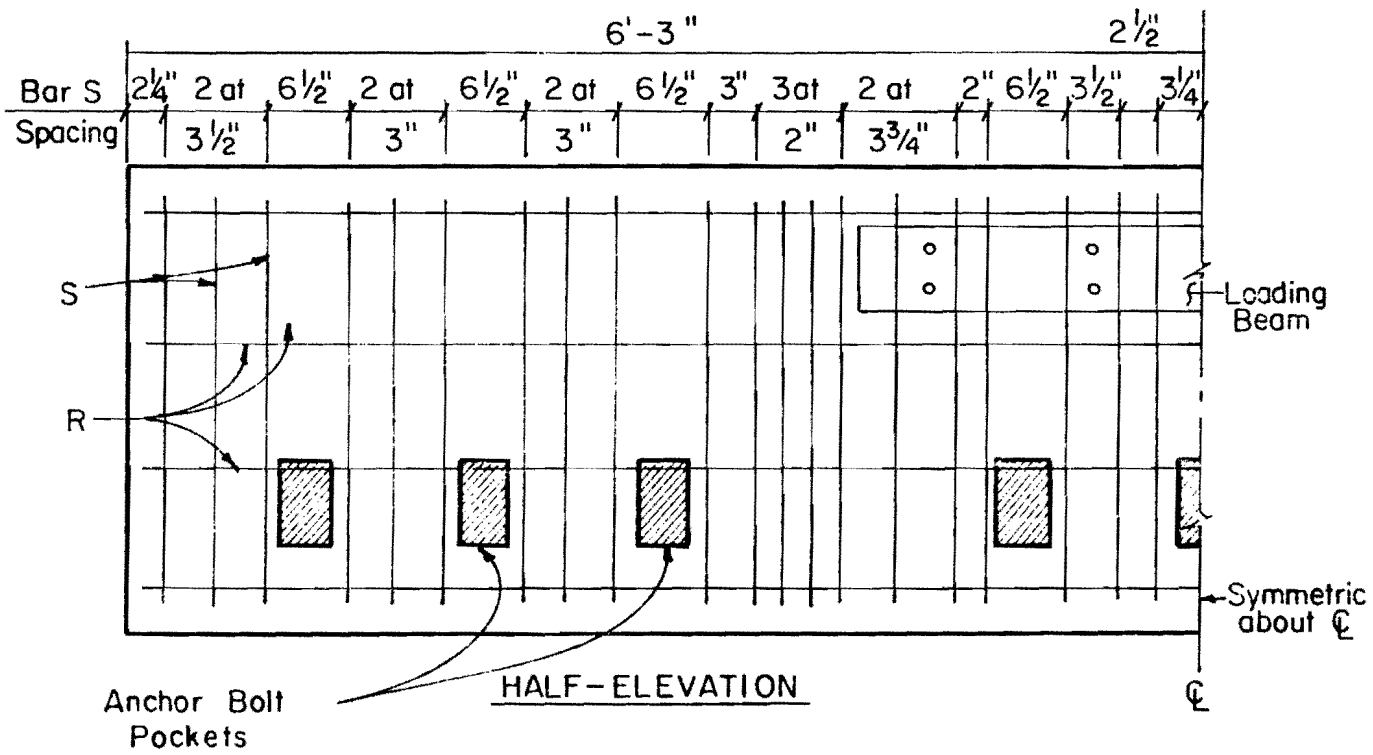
Spacing of transverse reinforcement in precast barrier
